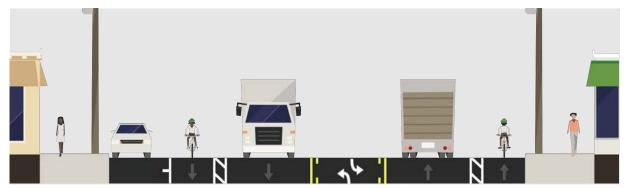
Proposed cross section of Evans Avenue between Rankin and Quint Streets, looking west
